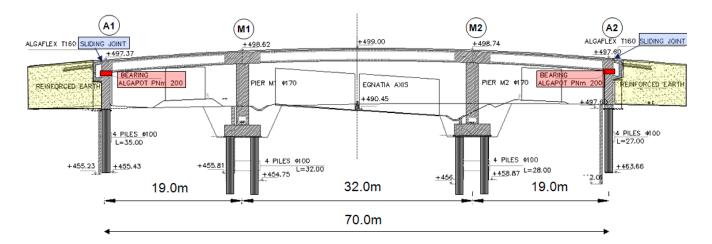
Longitudinal cross-section of the Egnatia highway bridge studied
